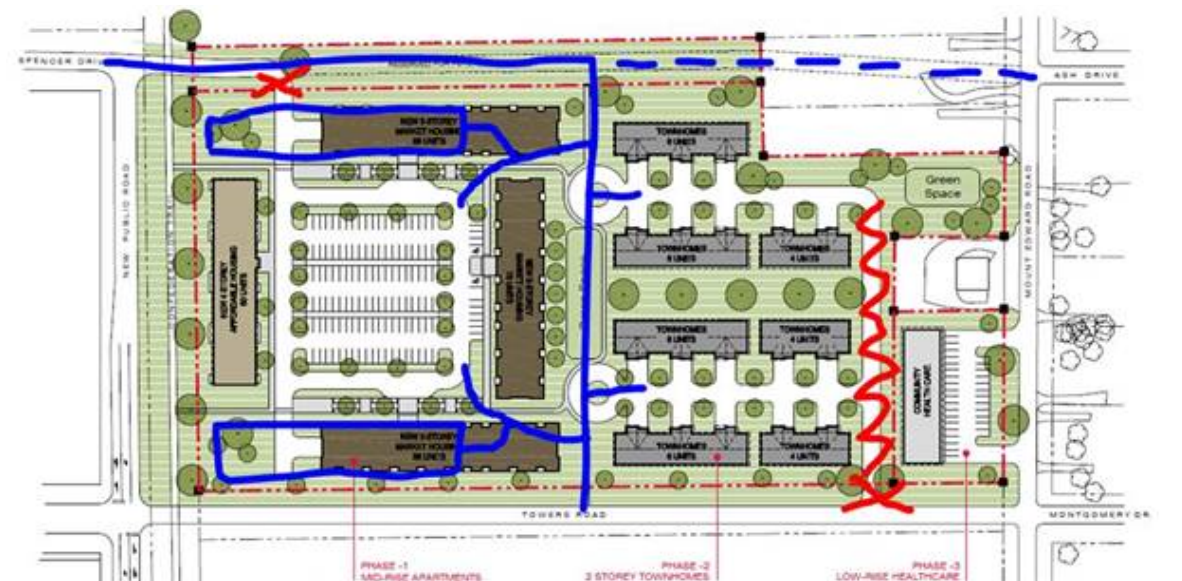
Proposed APM MacLean development with proposed N-S street (in blue)
